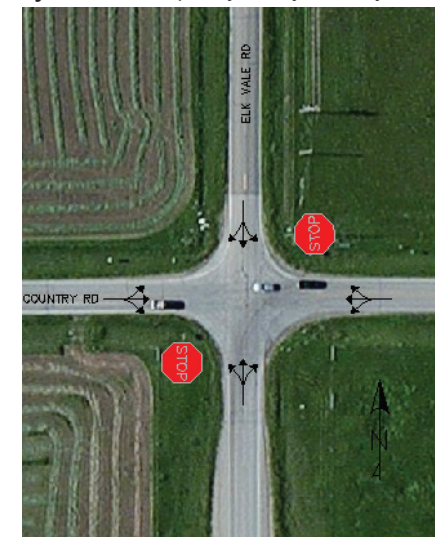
Elk Vale Road & Country Road Intersection Configuration
